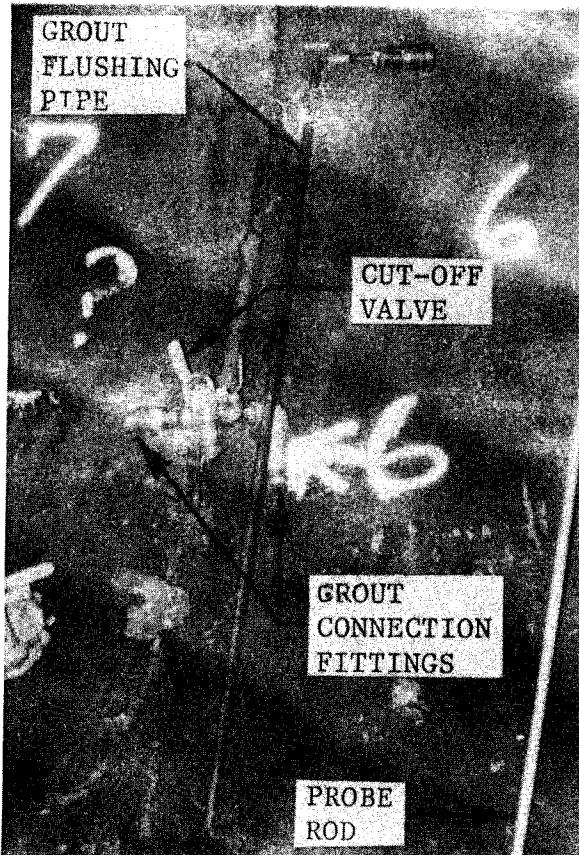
Grout hole with cutoff valve, Arkabutla Dam, 1977
